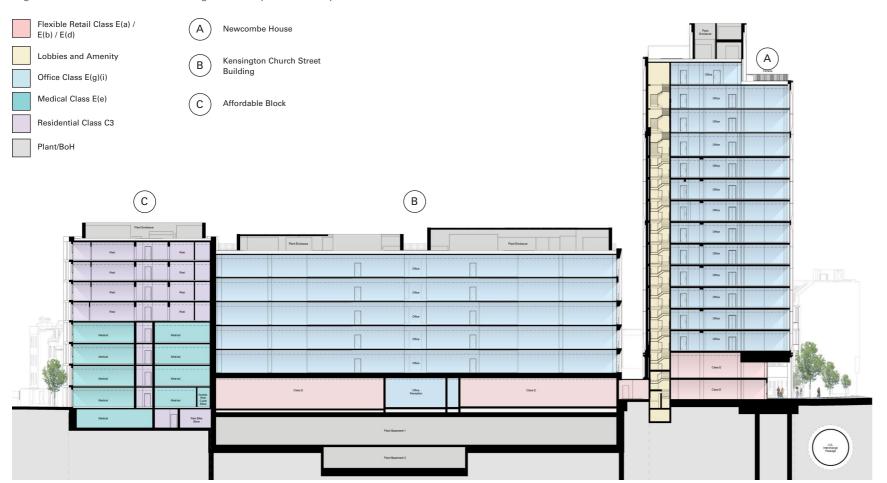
Sectional Use Diagram: Illustrative Long Section through Proposed Development
